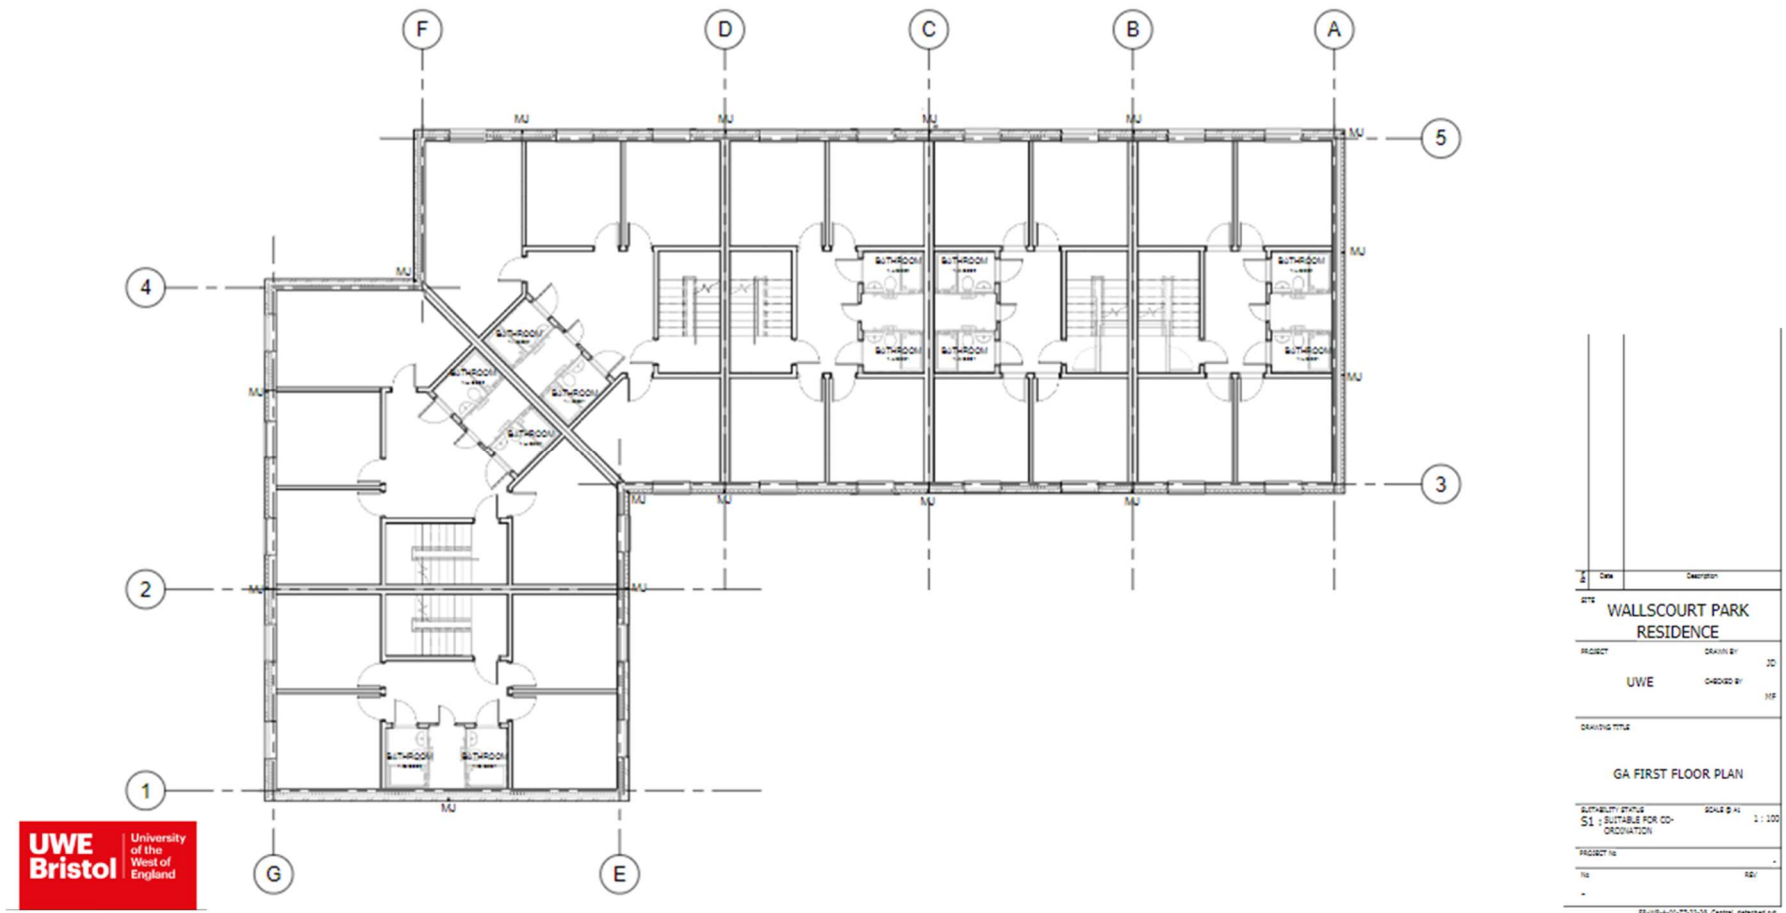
Plan of layout for houses G to L, first floor bedrooms and shower rooms (source: UWE)
